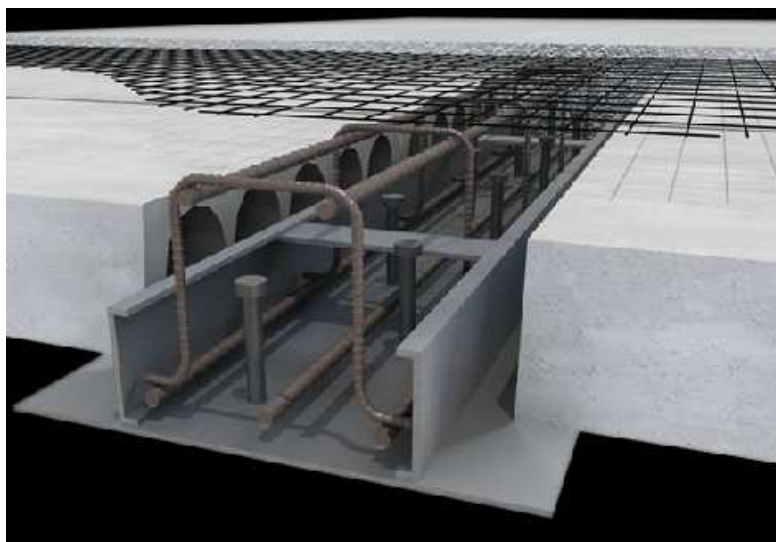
Diversakore Floor System (Diversakore, 2012)
